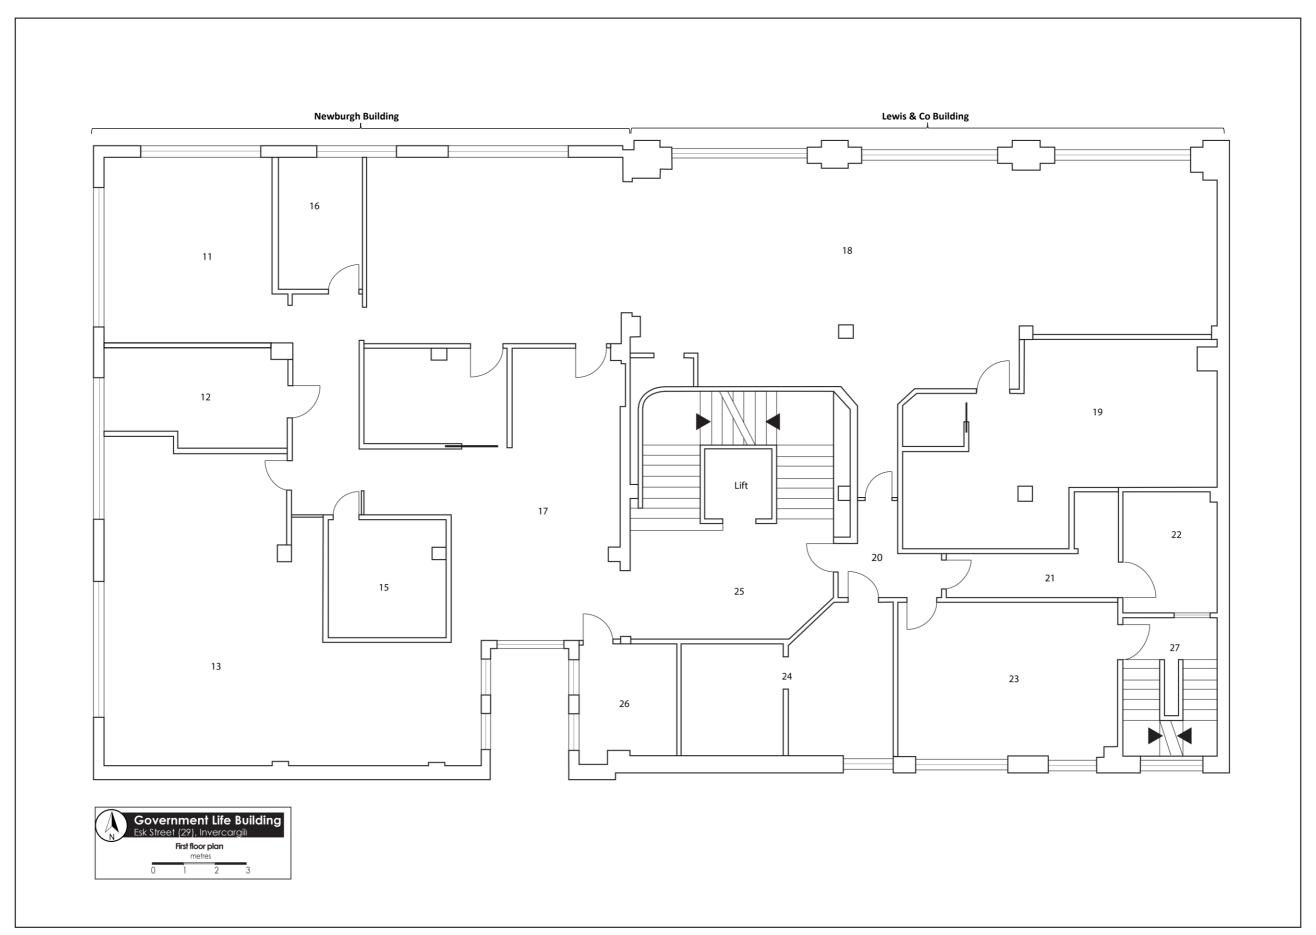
First floor plan of the Lewis & Co. (right) and the Newburgh (left) Buildings, collectively known as the Government Life Building.
